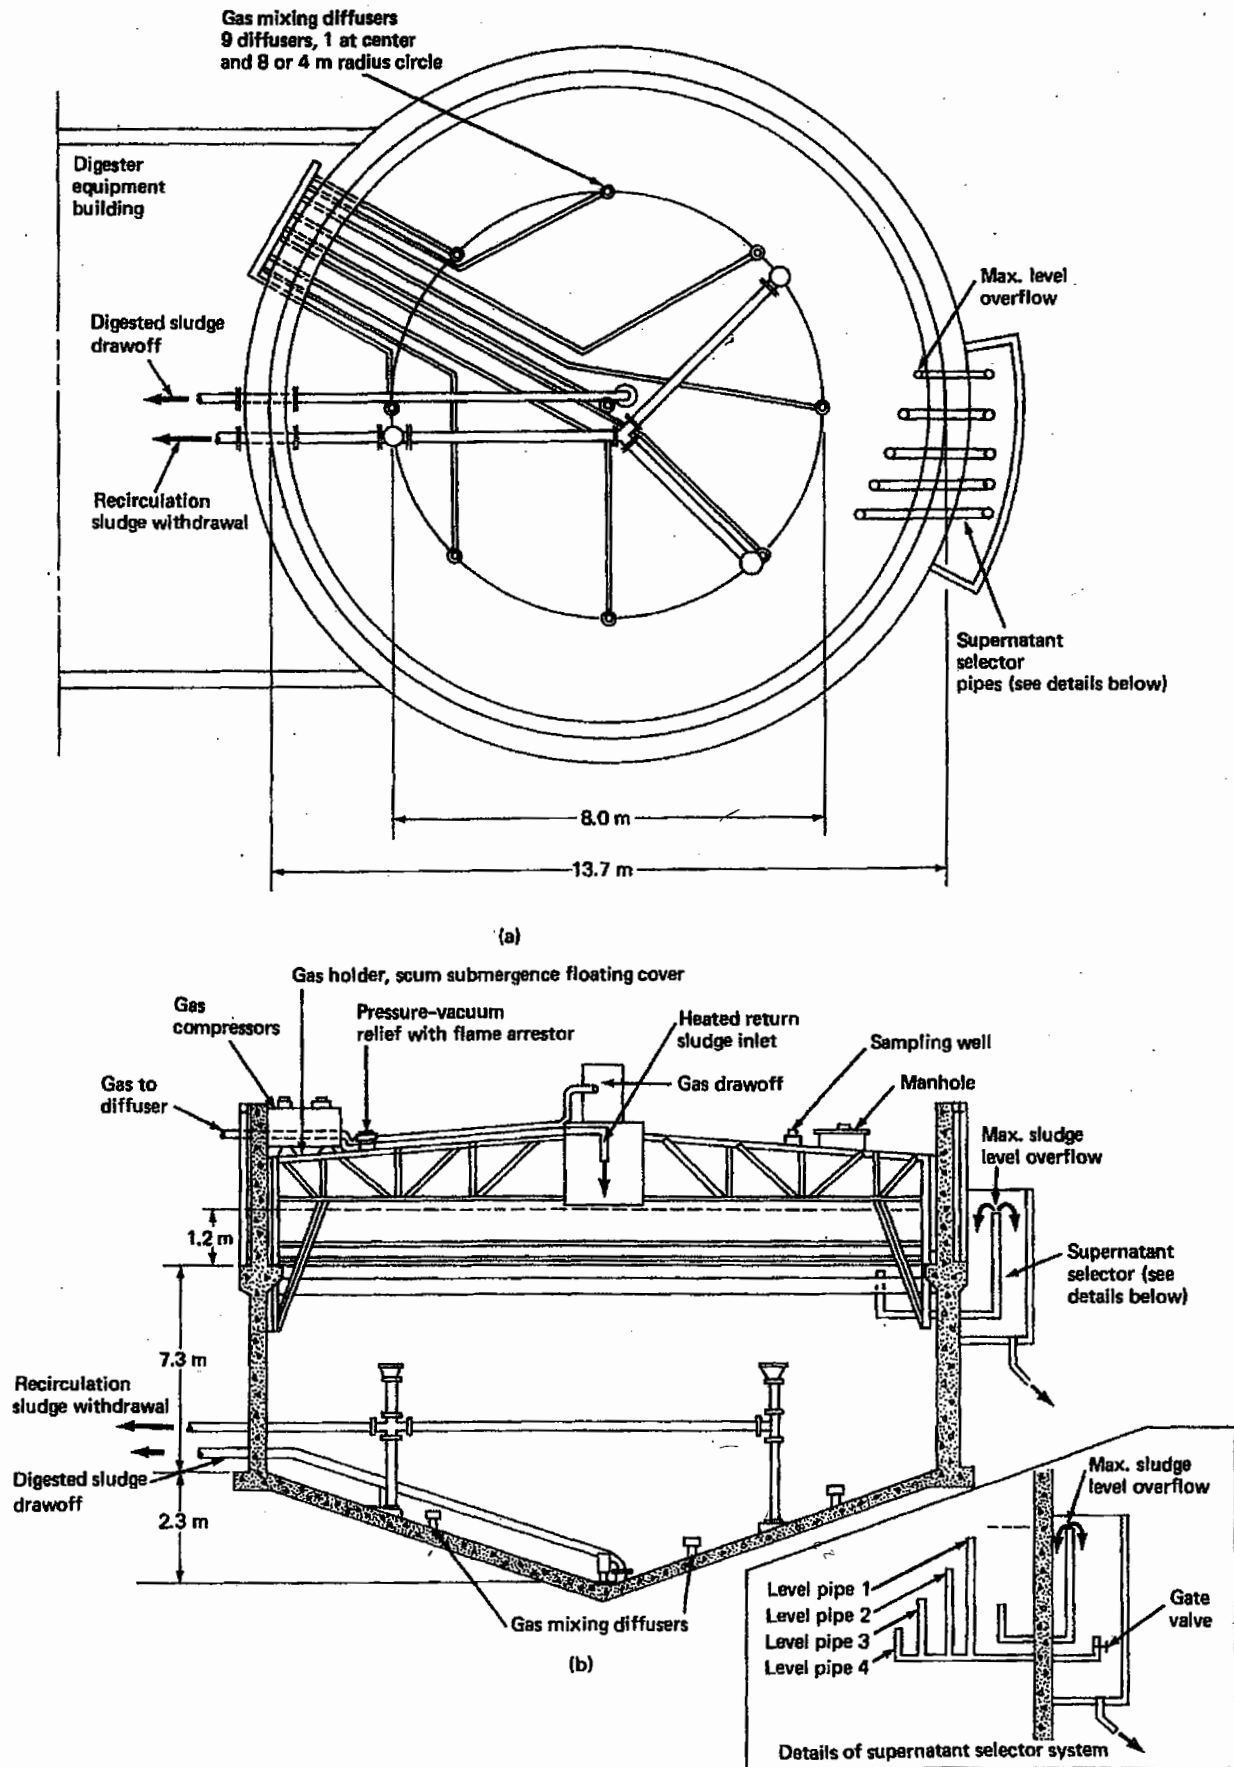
Design Details of Anaerobic Sludge Digester: (a) plan and (b) section.
